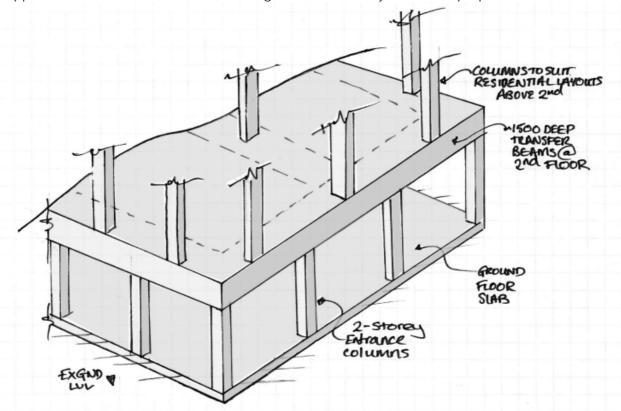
Indicative structural scheme for double height entrances in the towers of Blocks 4 and 5
